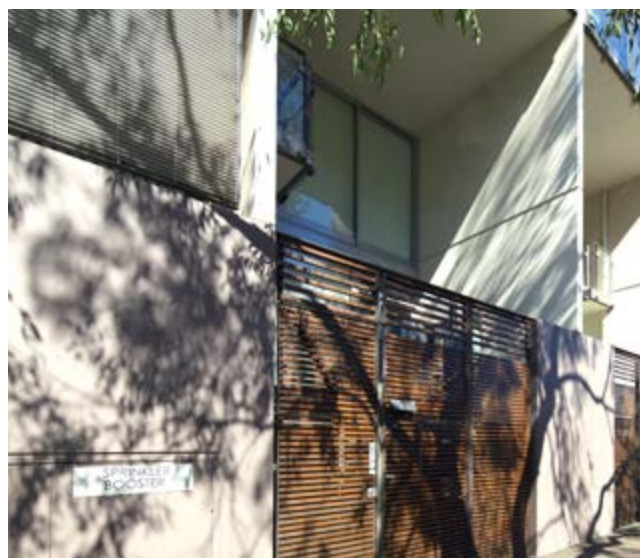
X.2 The building layout should provide easy access for maintenance and inspection of services and plant equipment
